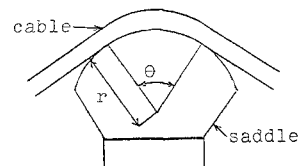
Sector angle and radius of saddle surface in contact with cable
